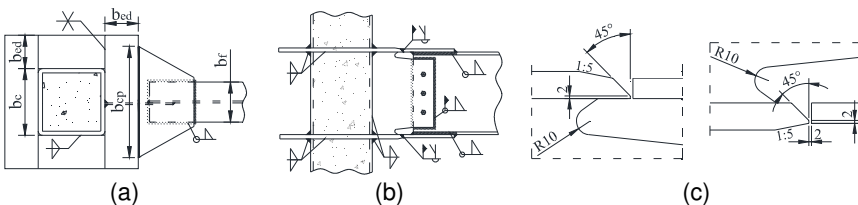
CP joint configuration: (a) & (b) conceptual scheme, (c) weld preparation details for on-site welded connections (cover plates to external diaphragm)
